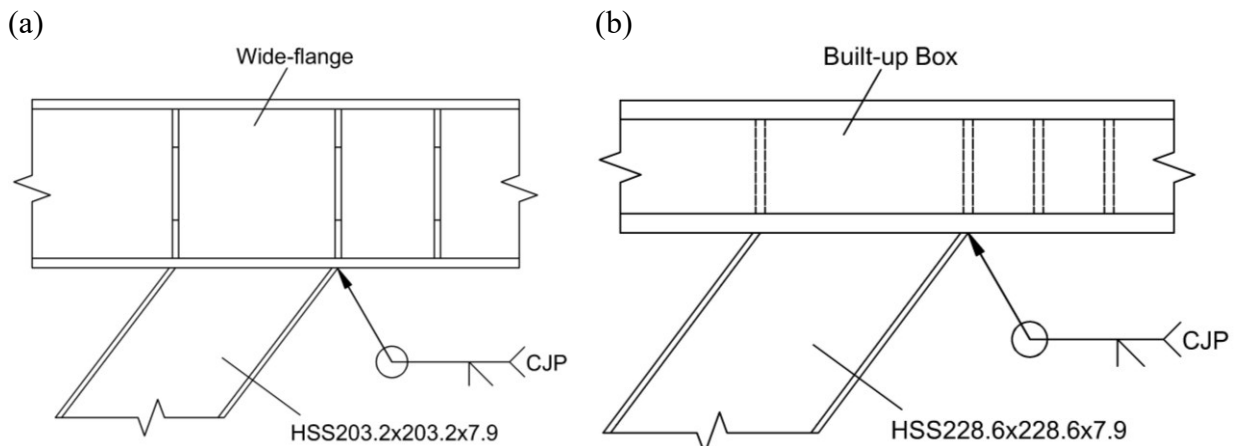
Brace-to-beam connection: (a) Specimens 1 and 2; (b) Specimen 3
